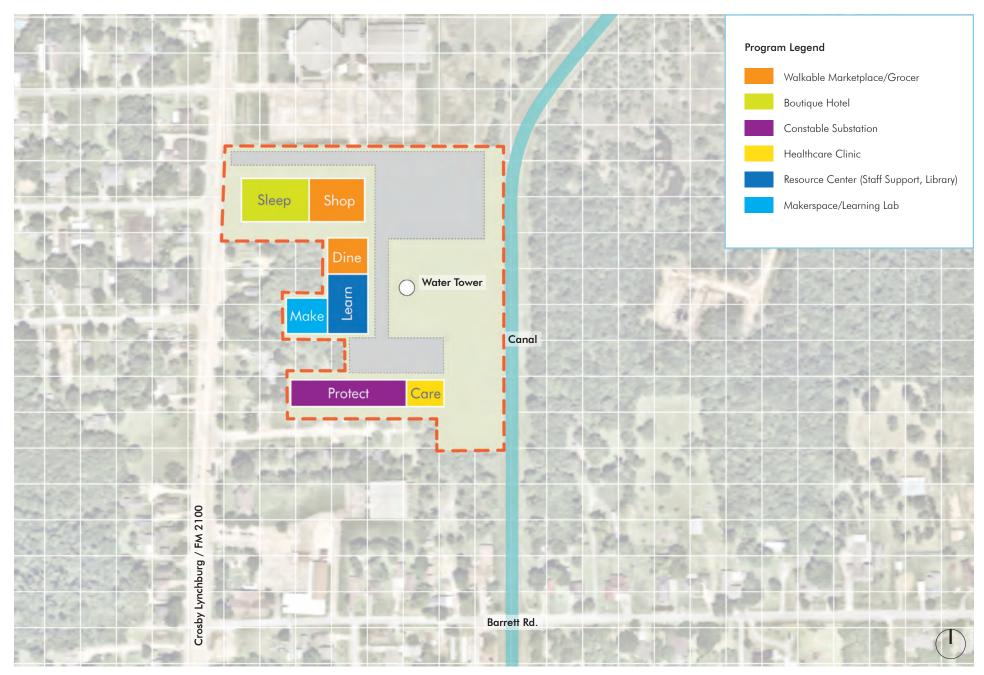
Option 2 Site Plan - Reduced Site Area
